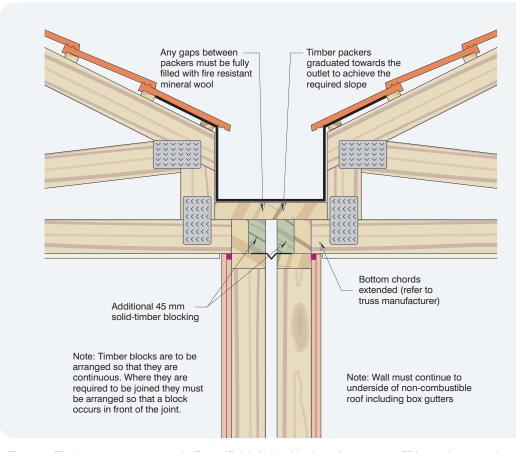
Timber trusses supported off sacrificial-timber blocks at box gutter – FRL 60 minutes – elevation view.
